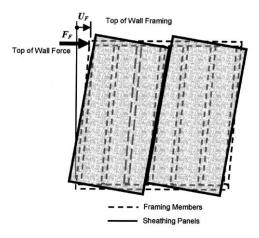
Assumption of racking mode for wood-framed shear walls [27].
